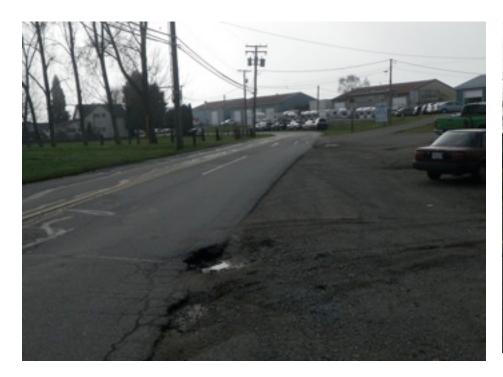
River Road West in S curve. Businesses and small industries line the road from Wellington Point Park to Westham Island Road and the Canoe Pass Marina and houseboat community.
